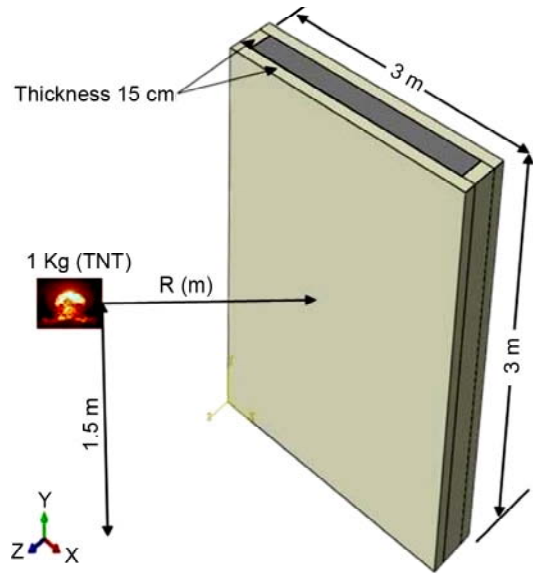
Blast wall geometry details (Adrees & Hussein, 2021).
